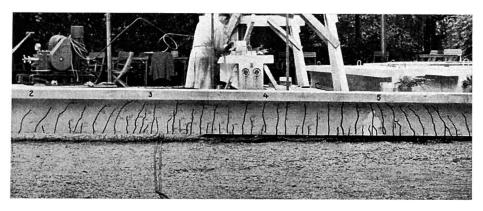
Crack Distribution in the Grouted T-Beam with Supplementary Mild Steel (TIM).
